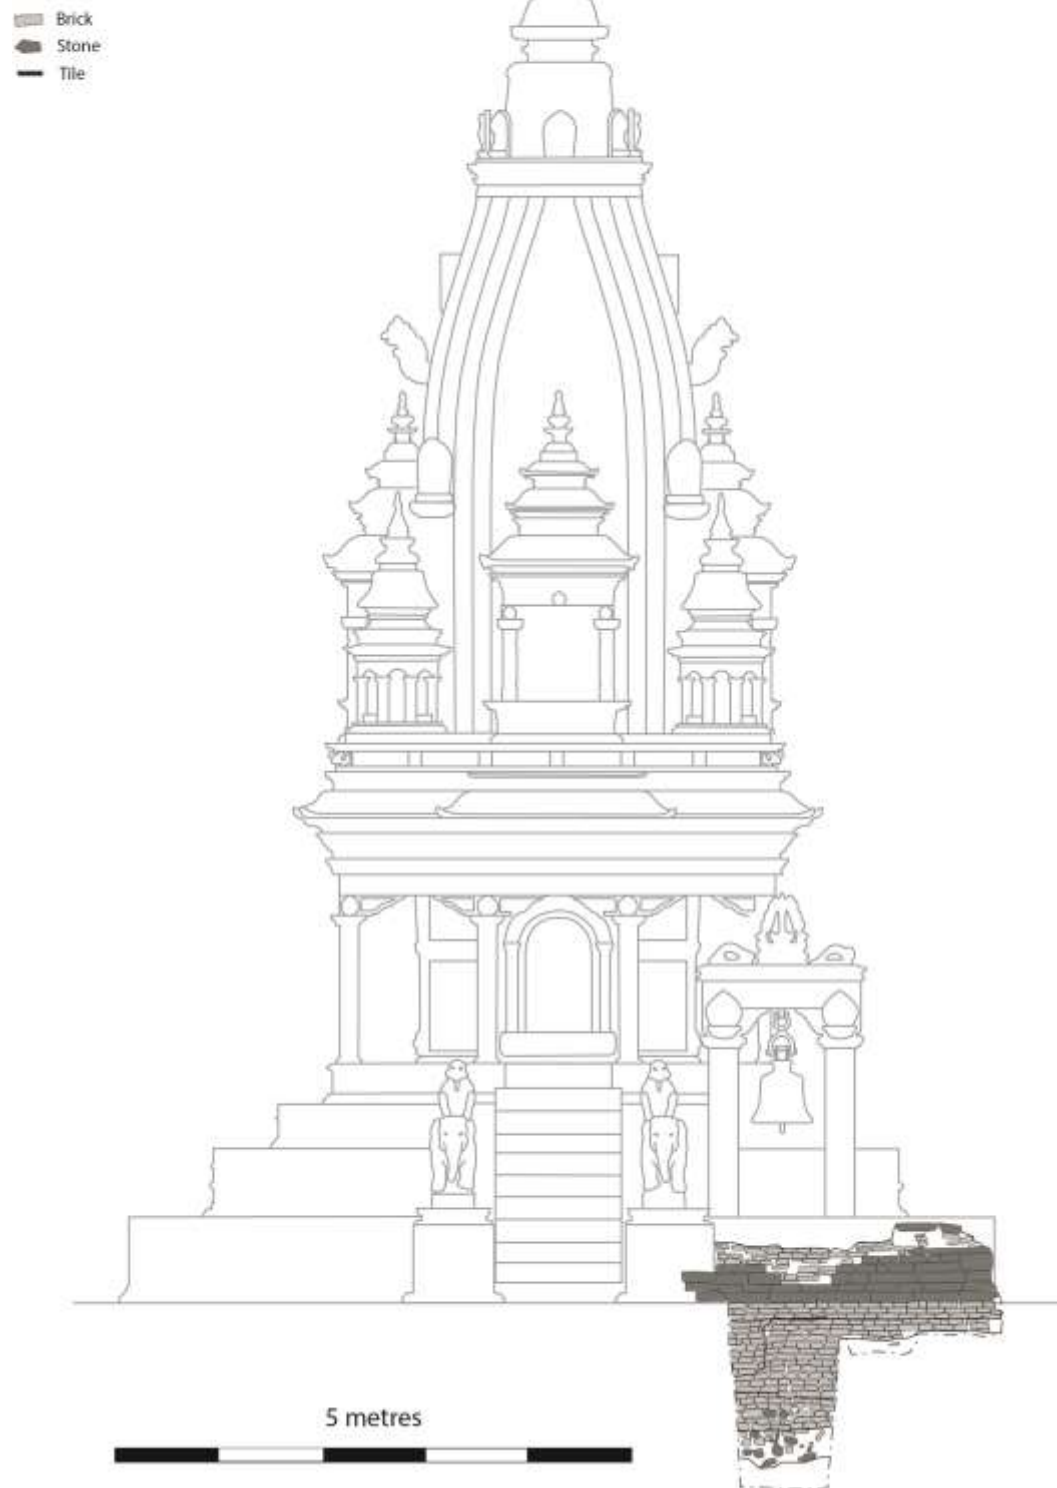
West facing section of Trench 1B, illustrating depth of foundations, with superimposed elevation of Vatsala Temple before collapse (Elevation of Vatsala Temple after Basukala et al. 2014).
